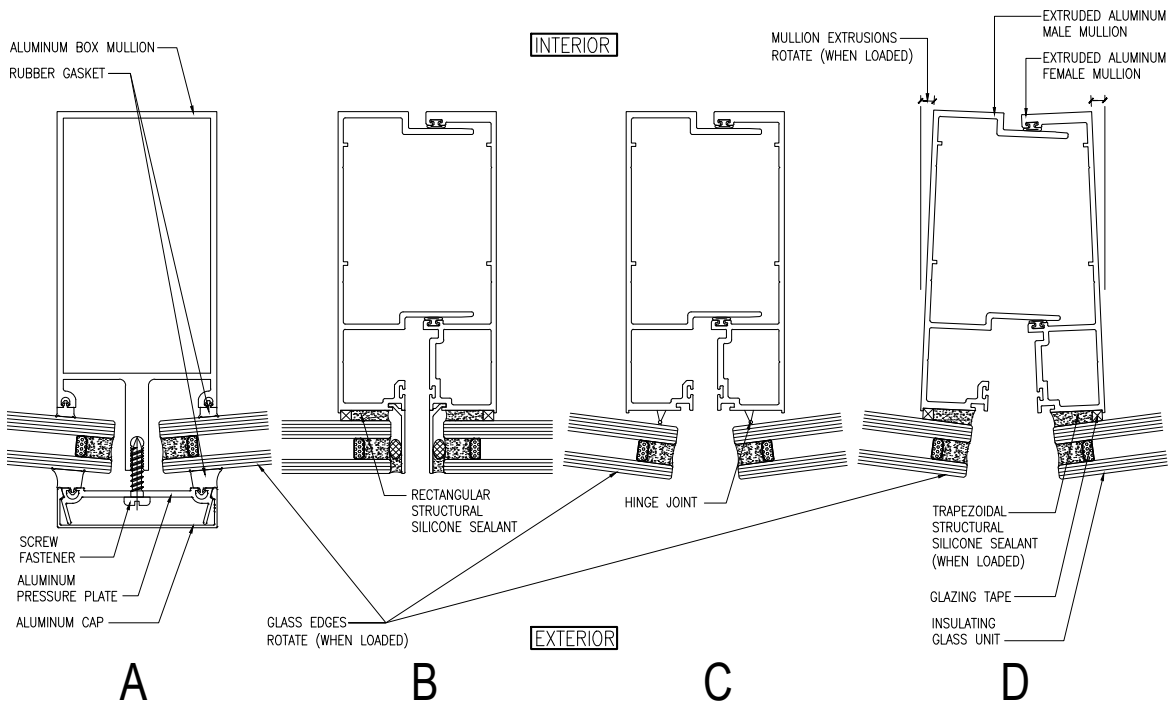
Cross-sectional shapes of vertical mullions. In detail “A”, glass is held mechanically to a simple box section. Structural sealant, in detail “B”, bonds glass to the male and female profiles of a unitized wall’s split mullion: this design’s structural idealization is shown in “C”, although “D” may be a better represent the wall’s actual behaviour when subjected to wind load.
